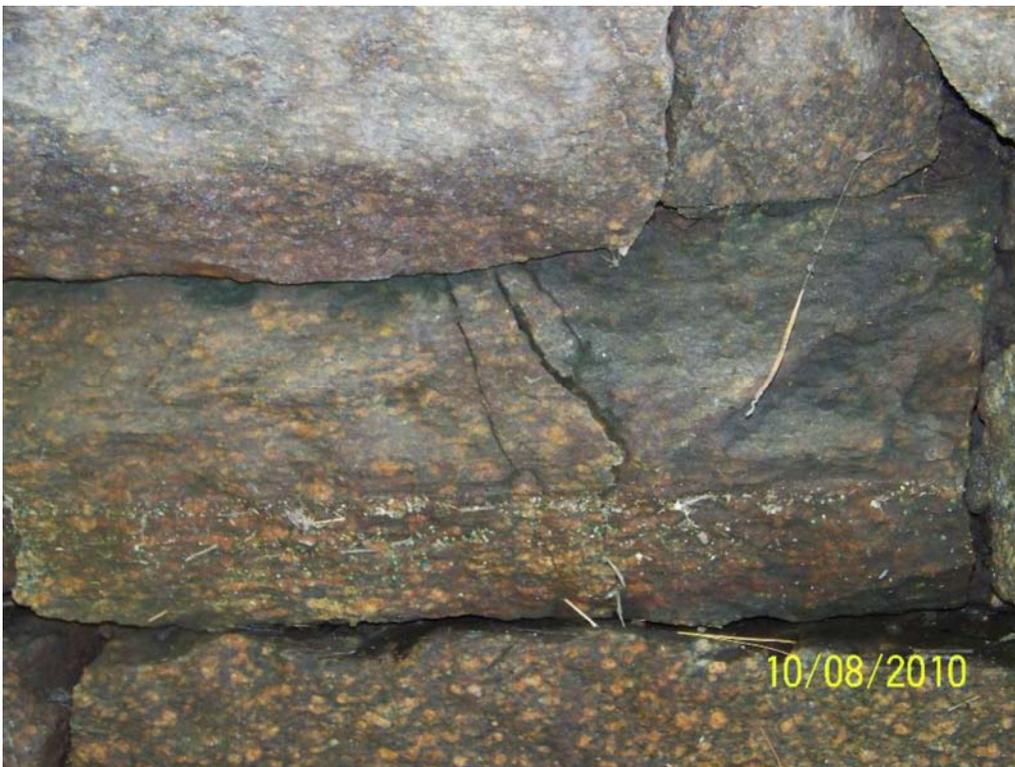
Fractured stone at the center of the East masonry breastwall.
